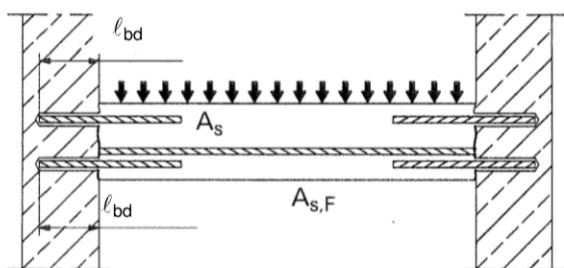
Overlapping joint at a foundation of a wall or column where the rebars are stressed in tension
